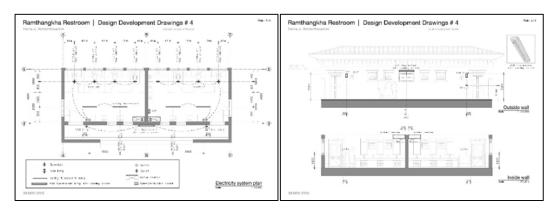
,18. Electrical system renovation drawings of Ramthangkha (Taktsang base) restrooms
